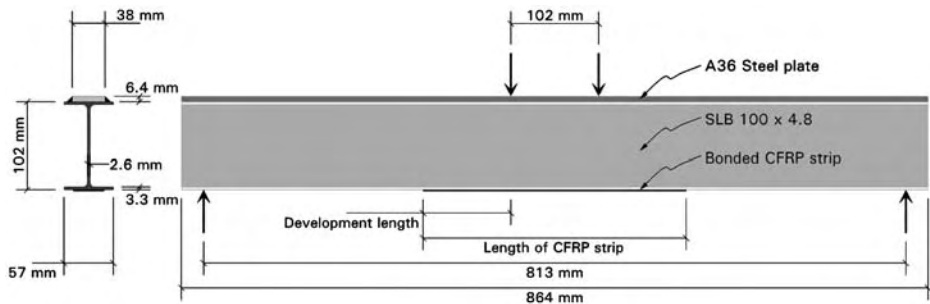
Cross-section dimensions and loading configuration of typical adhesive selection and development length specimen.
